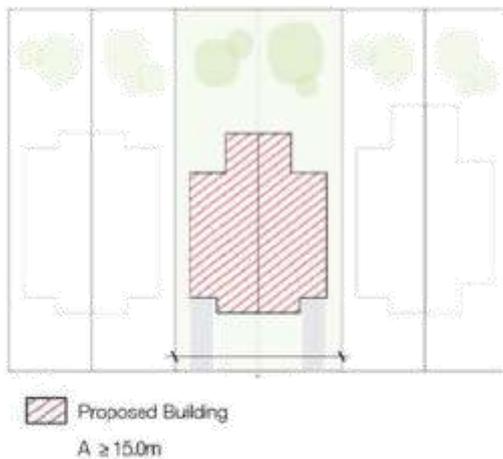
Minimum site width requirement of 15.0m for semi-detached style development
